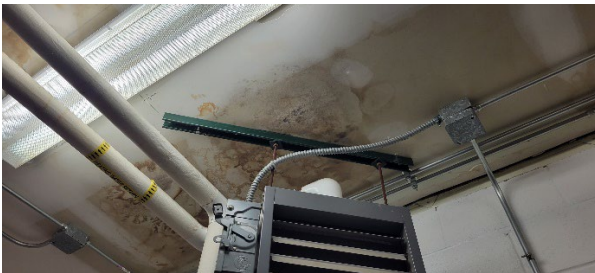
Water damaged ceiling in the Fire Panel/Electrical room during the assessment.
